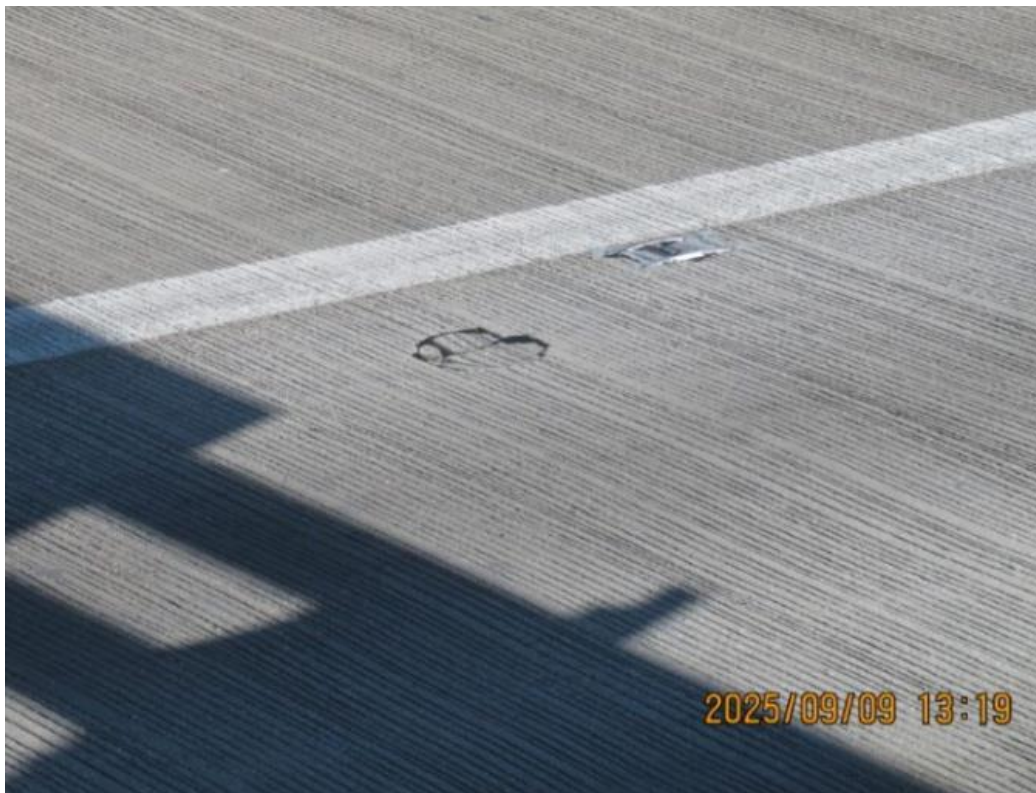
6" diameter spall forming in the center lane (Span 22C)
